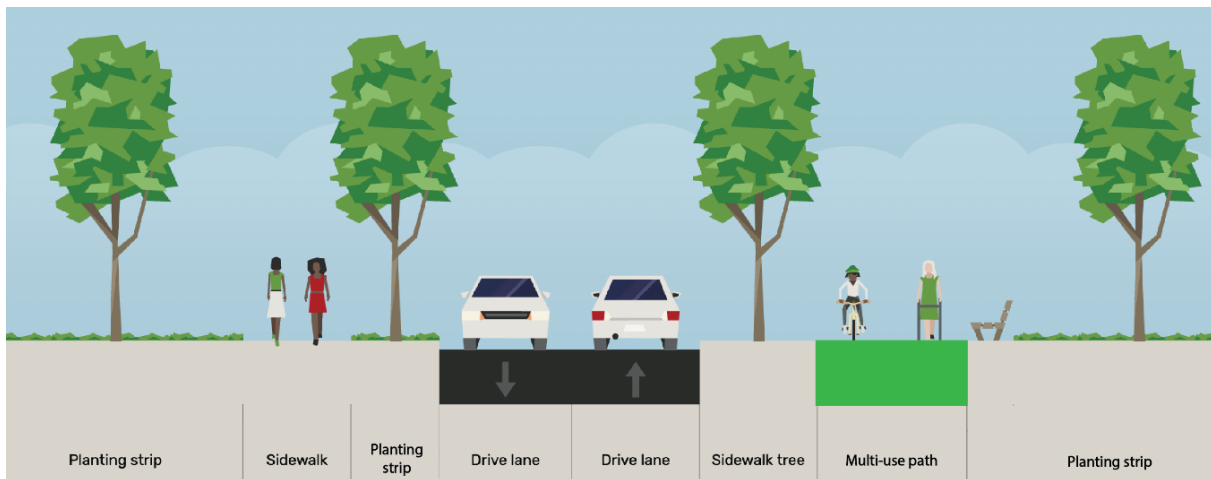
Recommended 30m wide cross-section for Liberty Street North and Concession Road 3 (Cross section conceptual and NTS)
